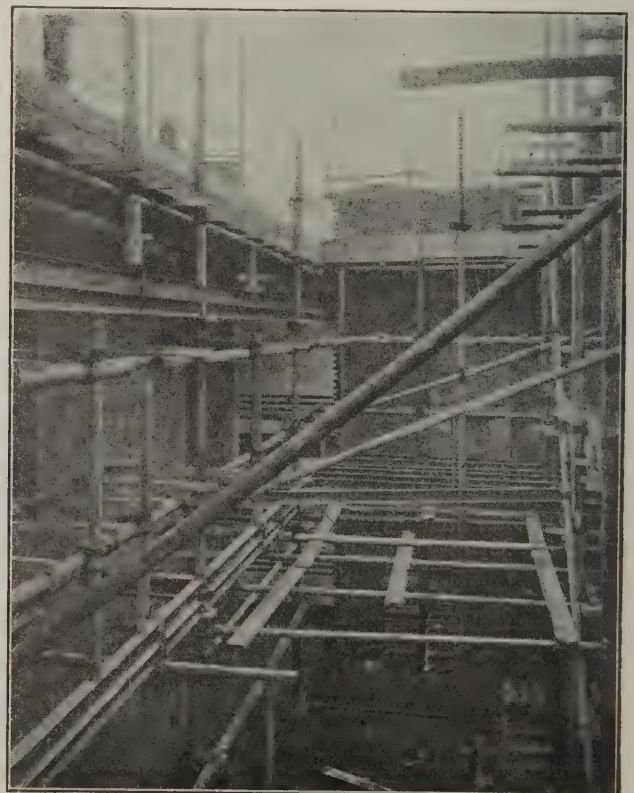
SHOWING PROGRESS MADE WITH MAIN WALLS WHILE WAITING FOR STEELWORK FOR FLOORS BETWEEN.
